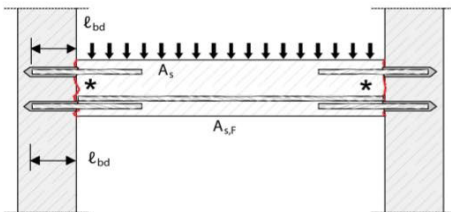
Anchoring of reinforcement to cover the line of acting tensile force.
